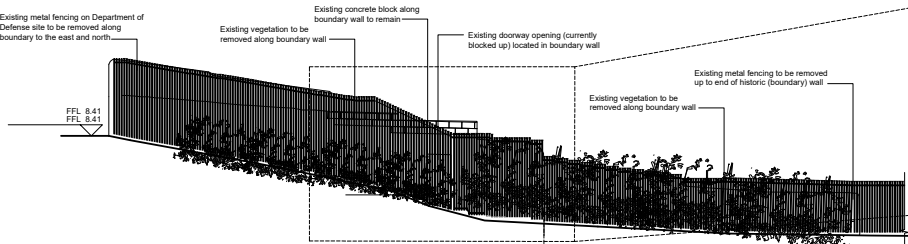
Elevation of the boundary wall from the Department of Defence Site
